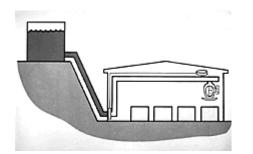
Illustration 5-2: Dry Pipe System, Discharge. The main advantage of dry pipe sprinkler systems is their ability to provide automatic protection in spaces where freezing is possible. Typical dry pipe installations include unheated warehouses and attics, outside exposed loading docks and within commercial freezers.
